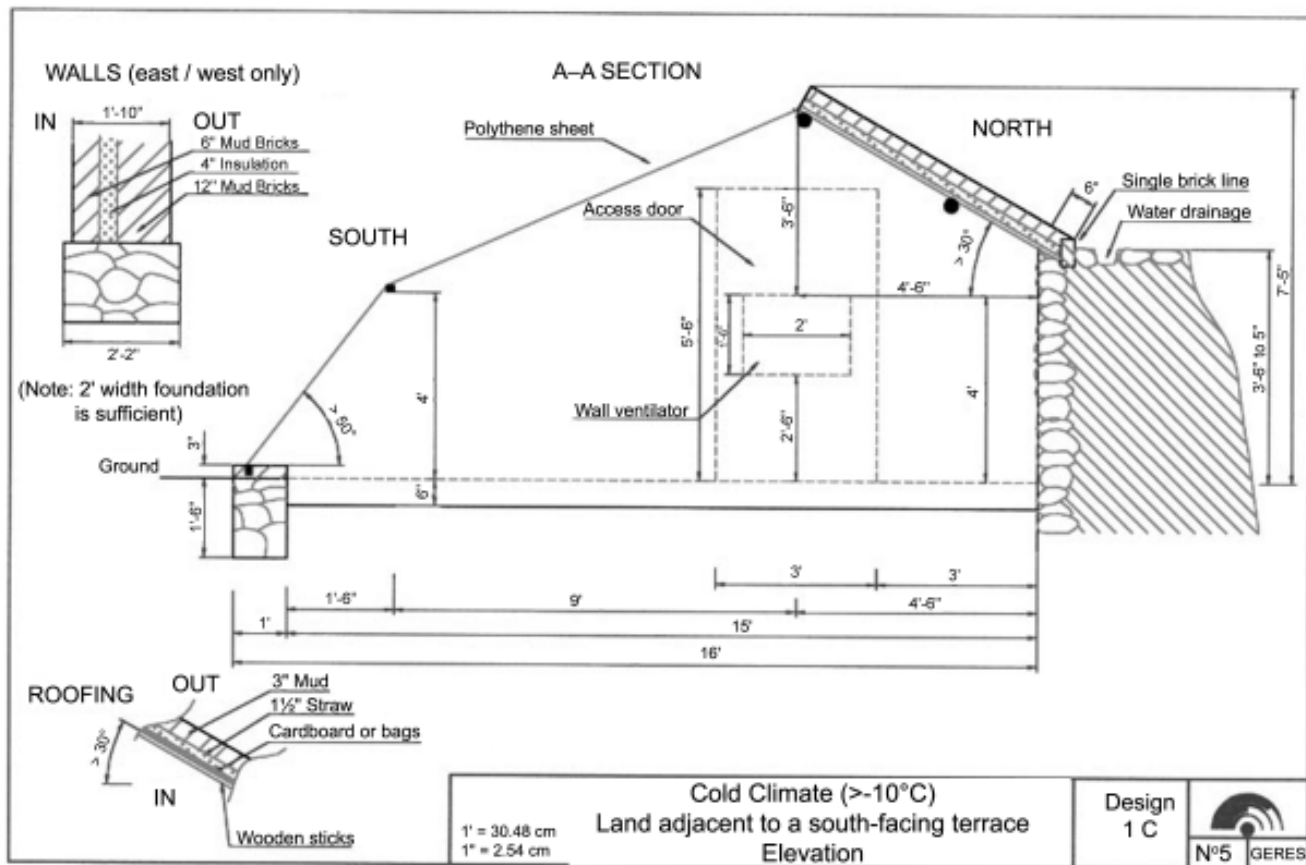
Design 1C - Greenhouse for cold climate, site adjacent to a south-facing terrace wall
